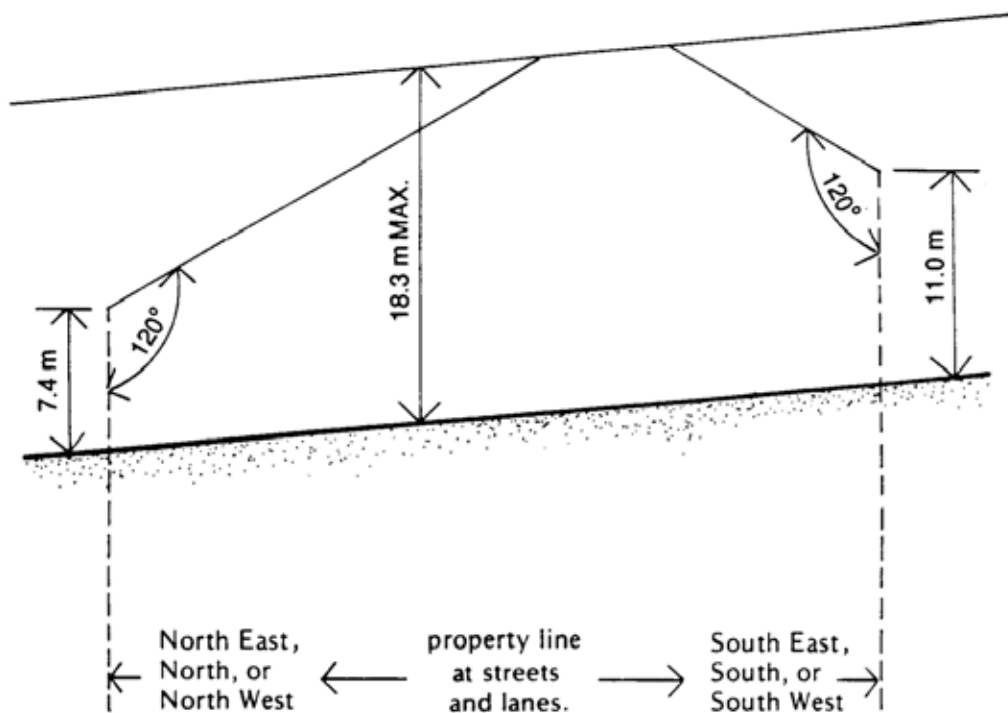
Building Envelope [no changes proposed to the current building envelope].
